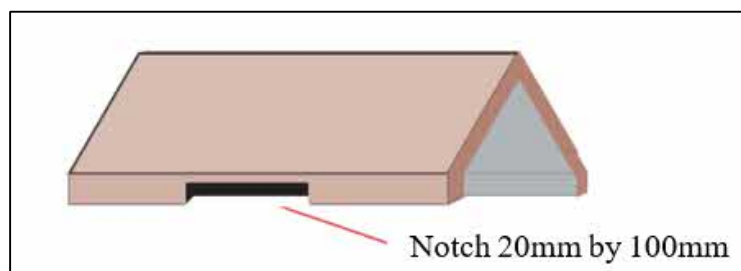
Creation of access and roosting opportunities under lifted ridge tiles in roof of new dwelling
